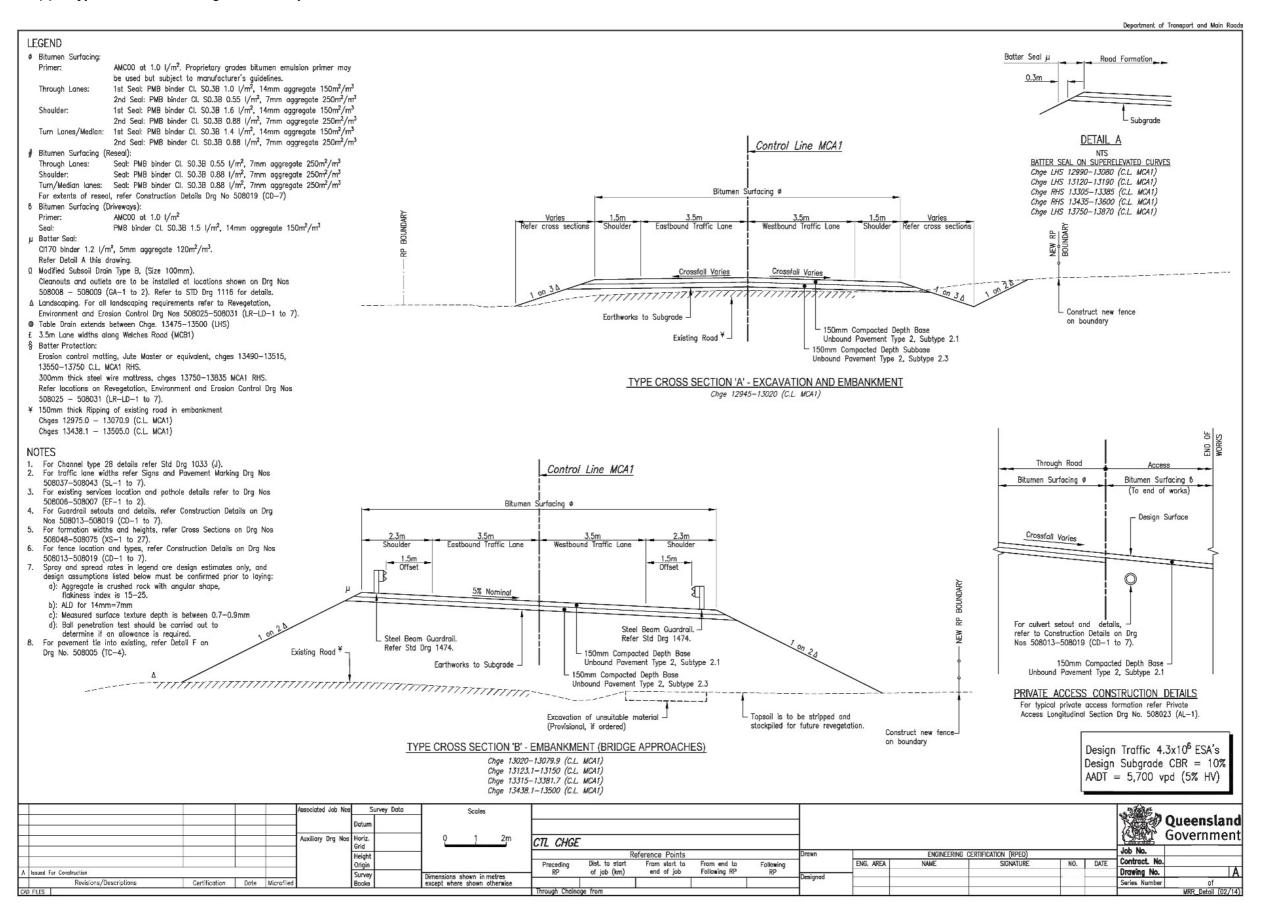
(b) – Type cross sections – generic example 1 – Sheet 2 of 2
